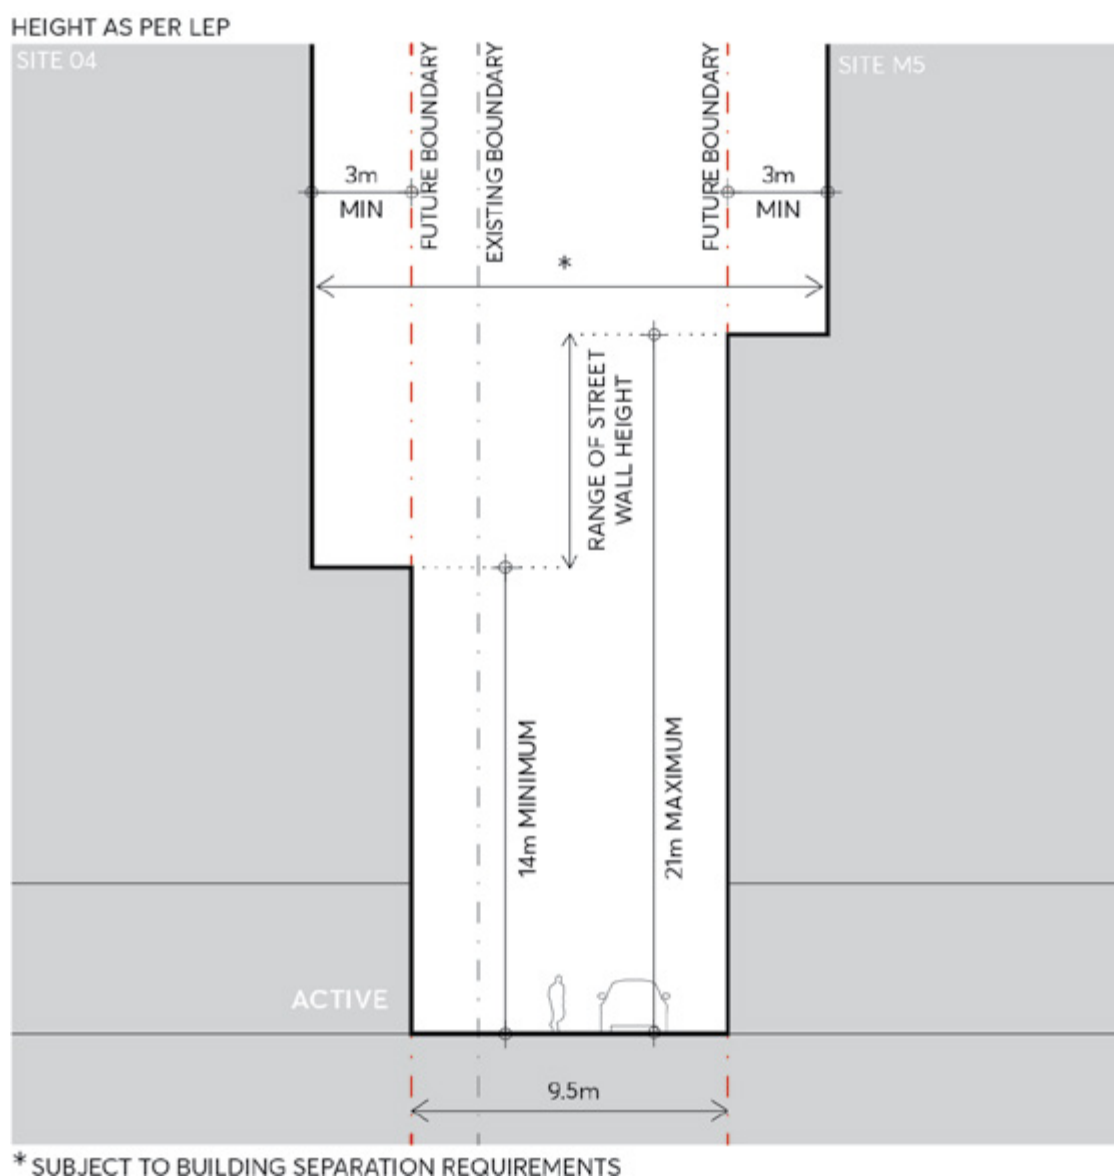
New Laneway between Site 04 and Site M5 (Section B) Setbacks & Street Wall Height
